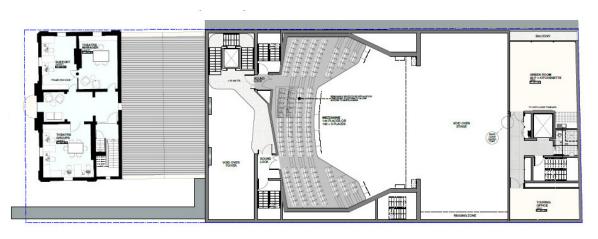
The Proposed Development - Level 2 (A112) Source: Brewster Hjorth Architects
